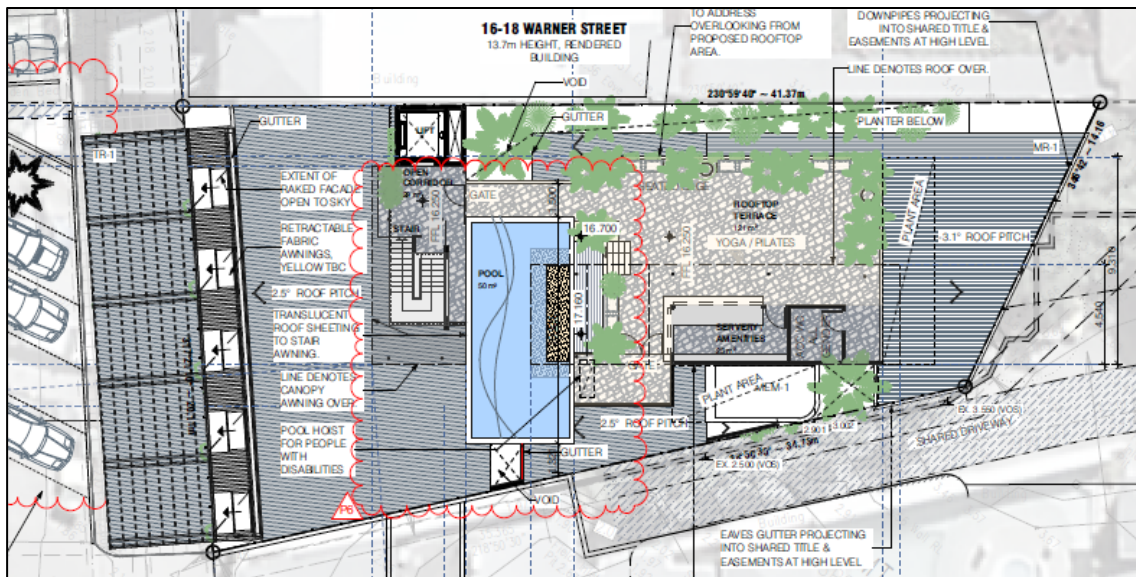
Approved Upper Level (Source: Wolveridge Architects)
